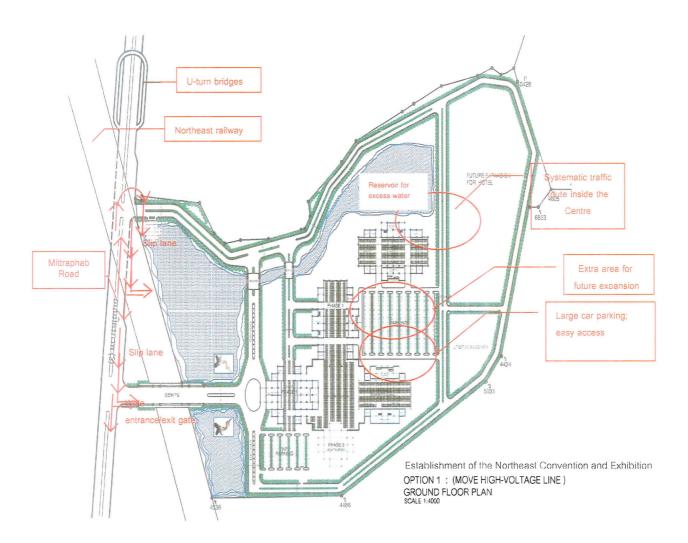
Ground floor plan of the Northeast Convention and Exhibition Centre
